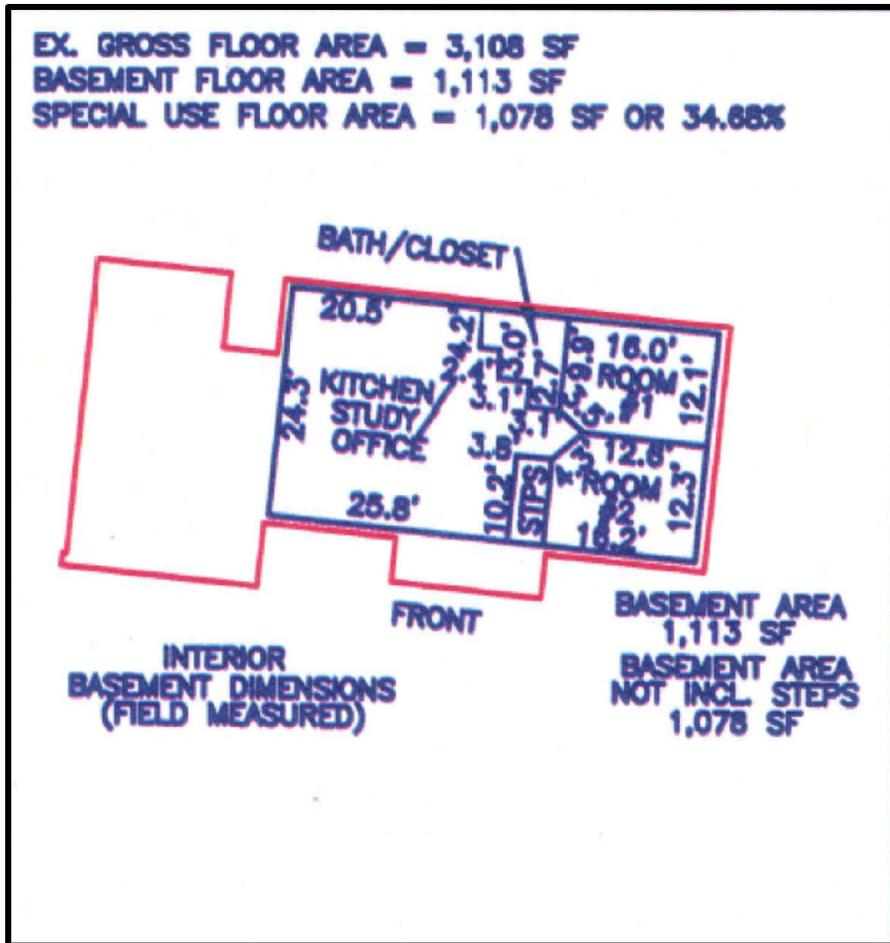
The layout of the proposed/existing ADU. Source: Applicant.
